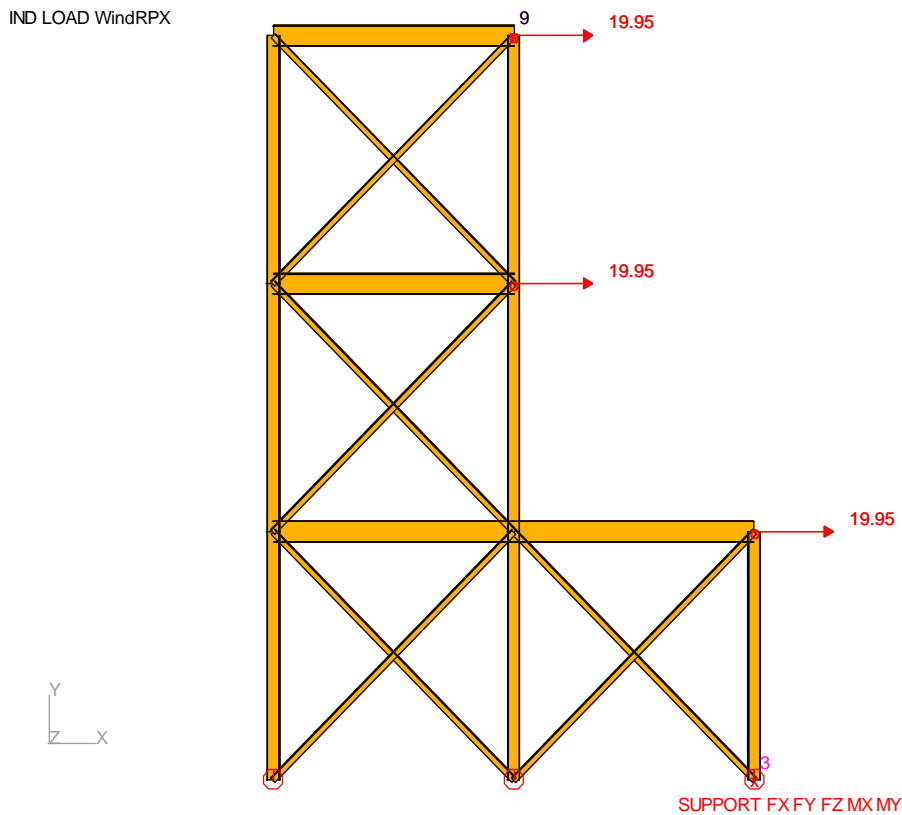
Braced Plane Frame Example Subjected to Joint Constraint at Top Right Joint – Joint 9
